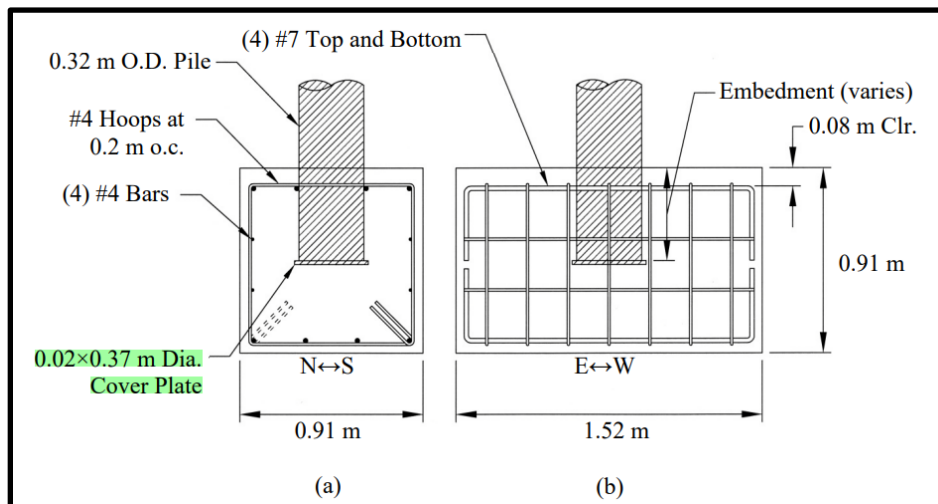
Typical specimen (a) End view; (b) side view [10]
